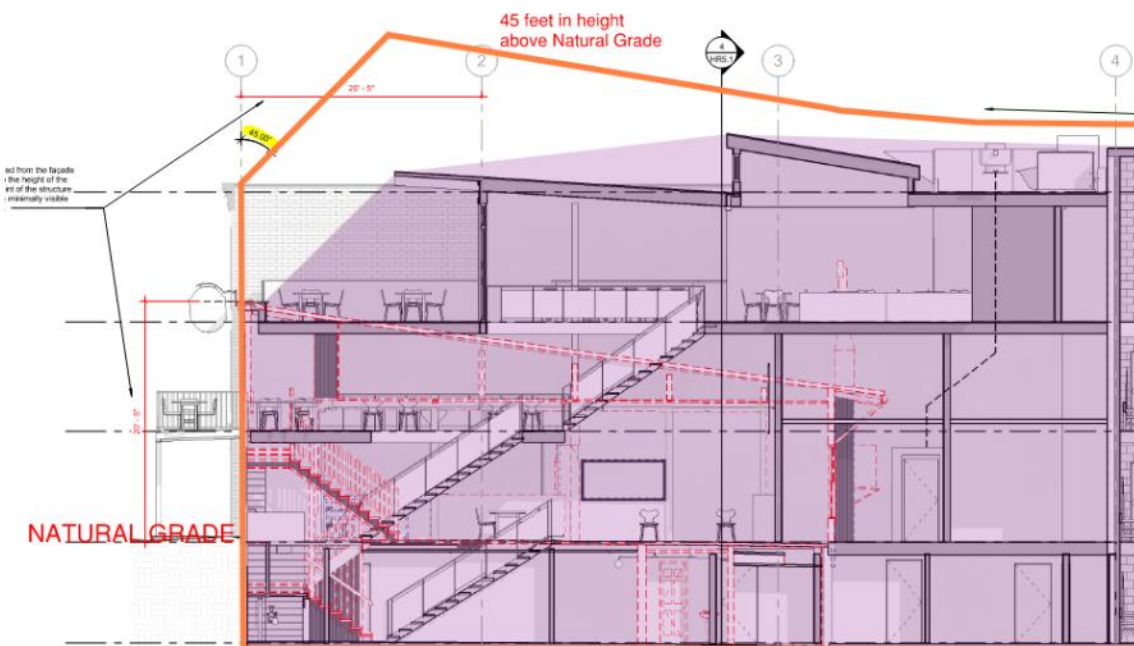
Excerpt from Applicant's plans showing the maximum Building volume highlighted in orange and the proposed Building volume.
